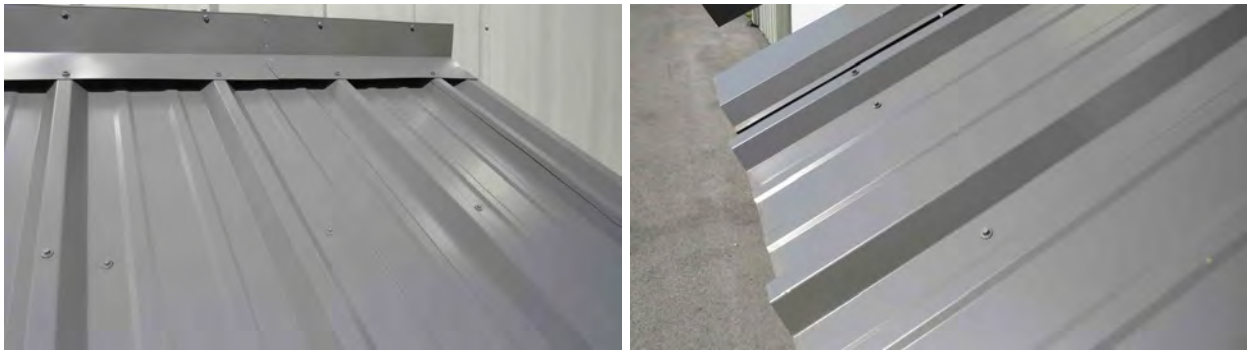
Roofing on the physical plant building (10) with no hail damage.
